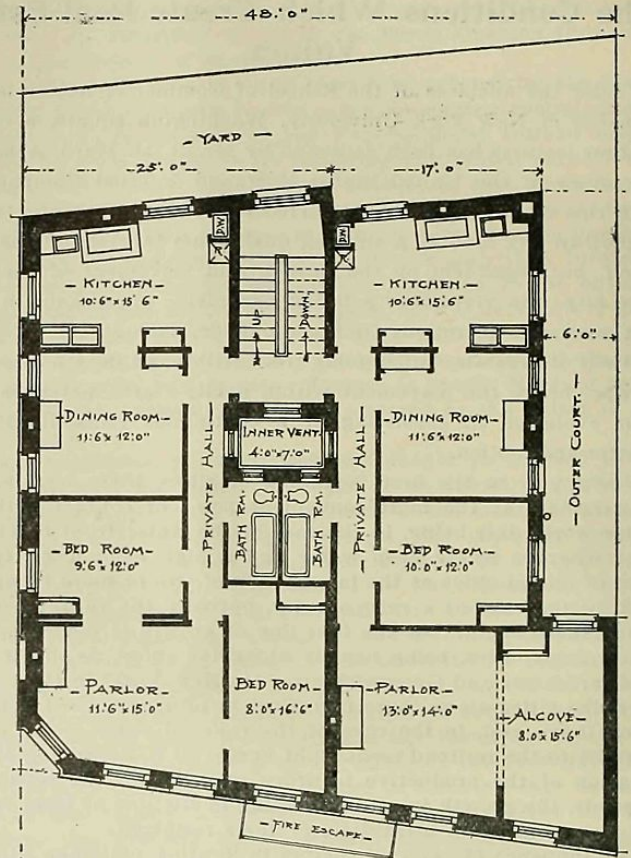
SOUTHWEST CORNER OF 156TH STREET AND ST. ANN'S AVENUE.
